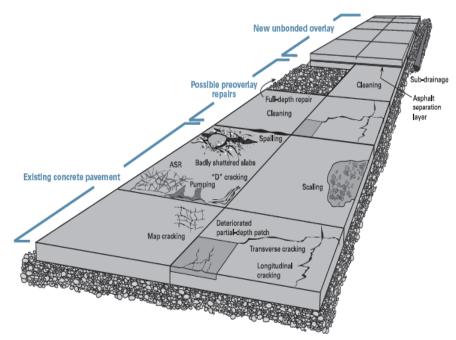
Notable distress on existing pavement and possible repairs for UBCOs [4]
